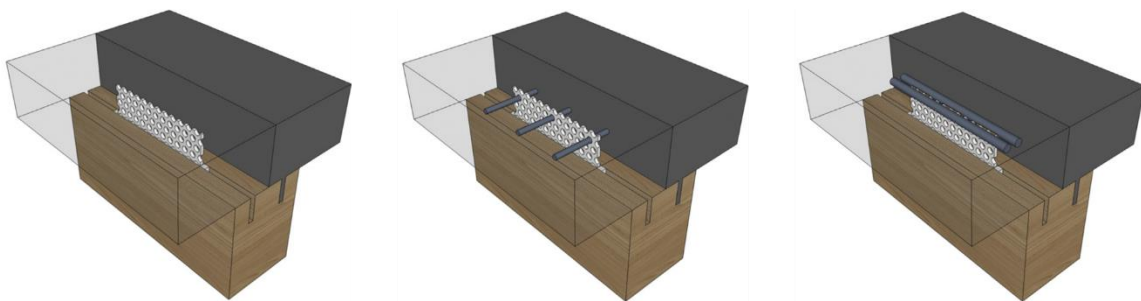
Steel plates as a shear connector, Dolores et al. [72]
